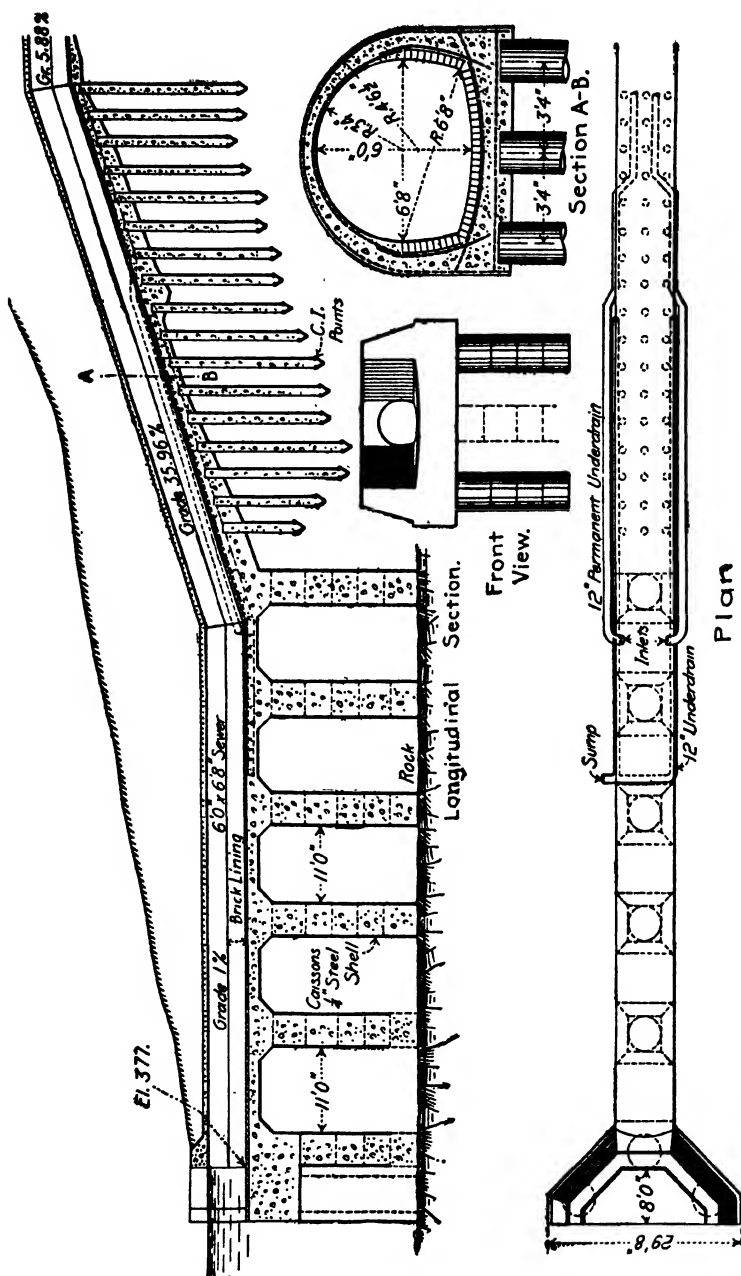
Northwestern outlet structure, Louisville, Ky.
